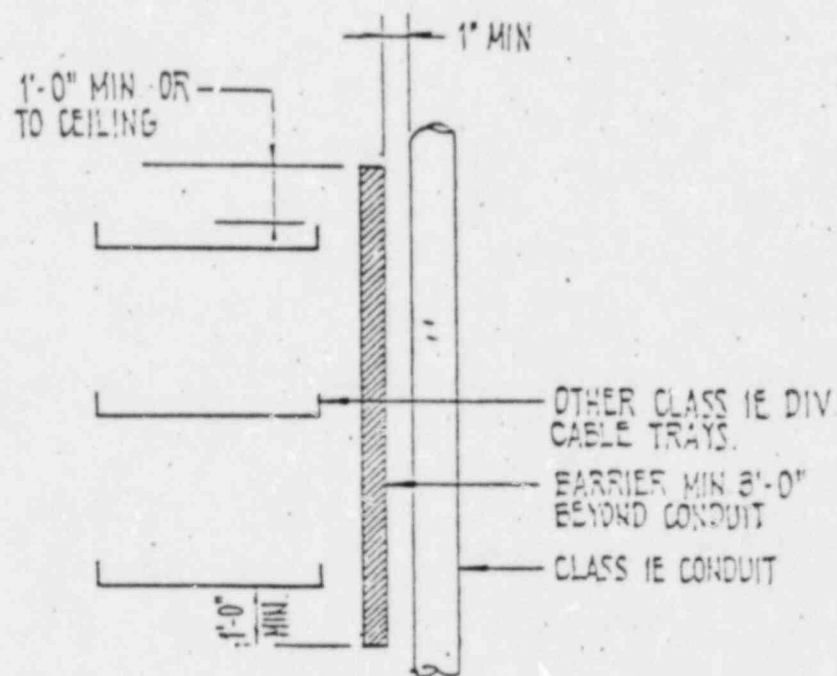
ARRANGEMENT FOR VERTICAL SAFETY CONDUITS
